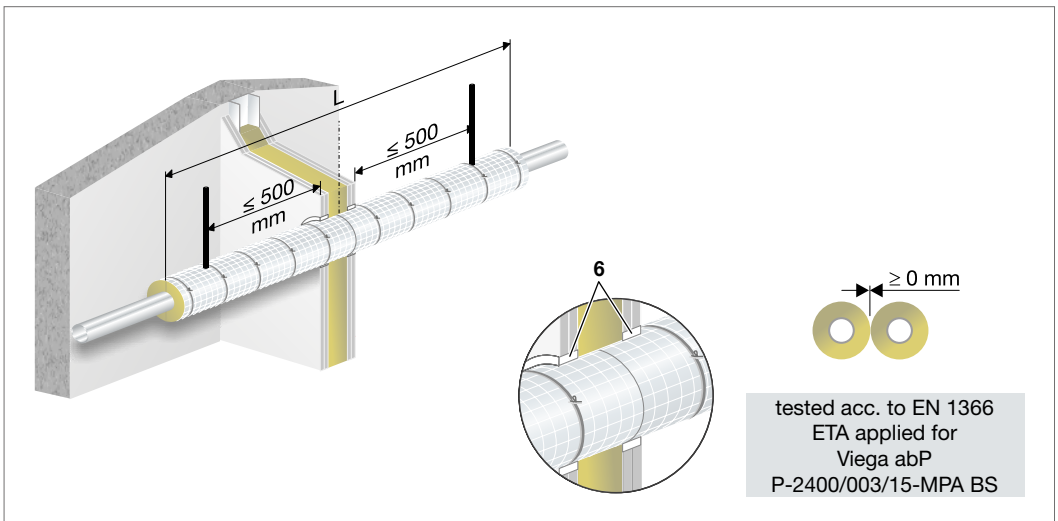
Viega piping system without/with Smartloop Inliner circulation – Installation in light-weight partition
